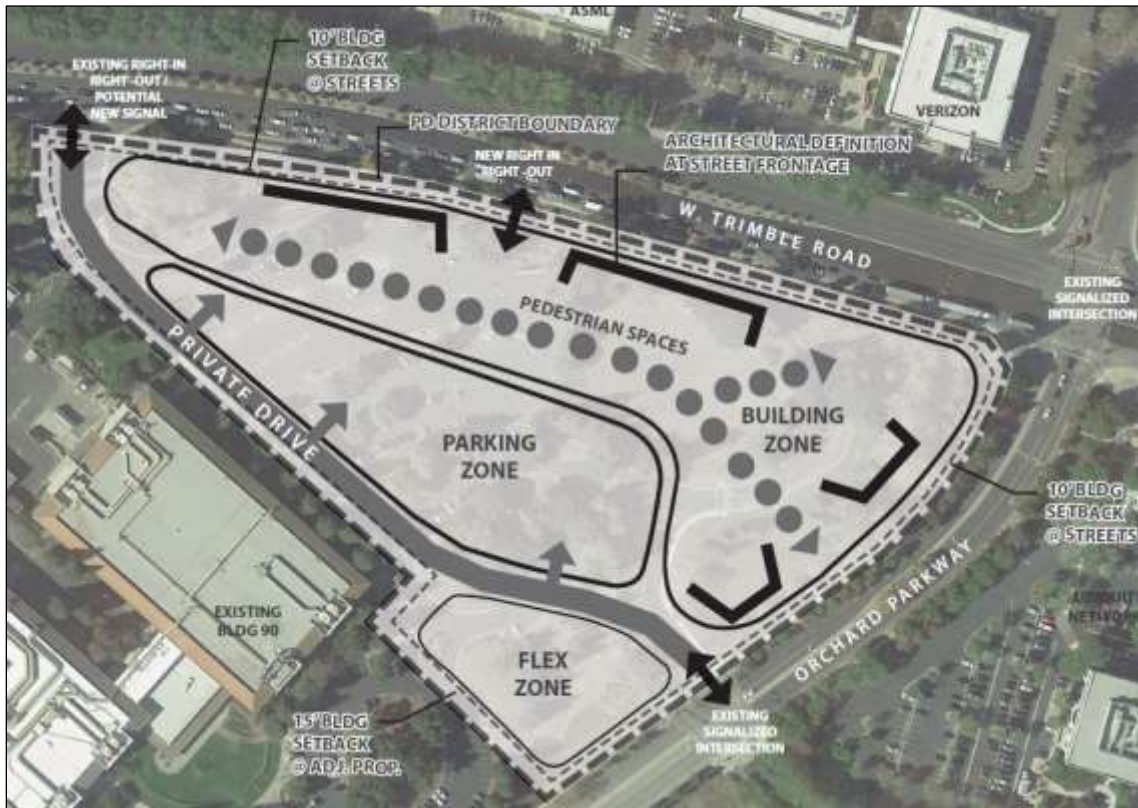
Conceptual Site Plan (larger plan set attached to Staff Report)
